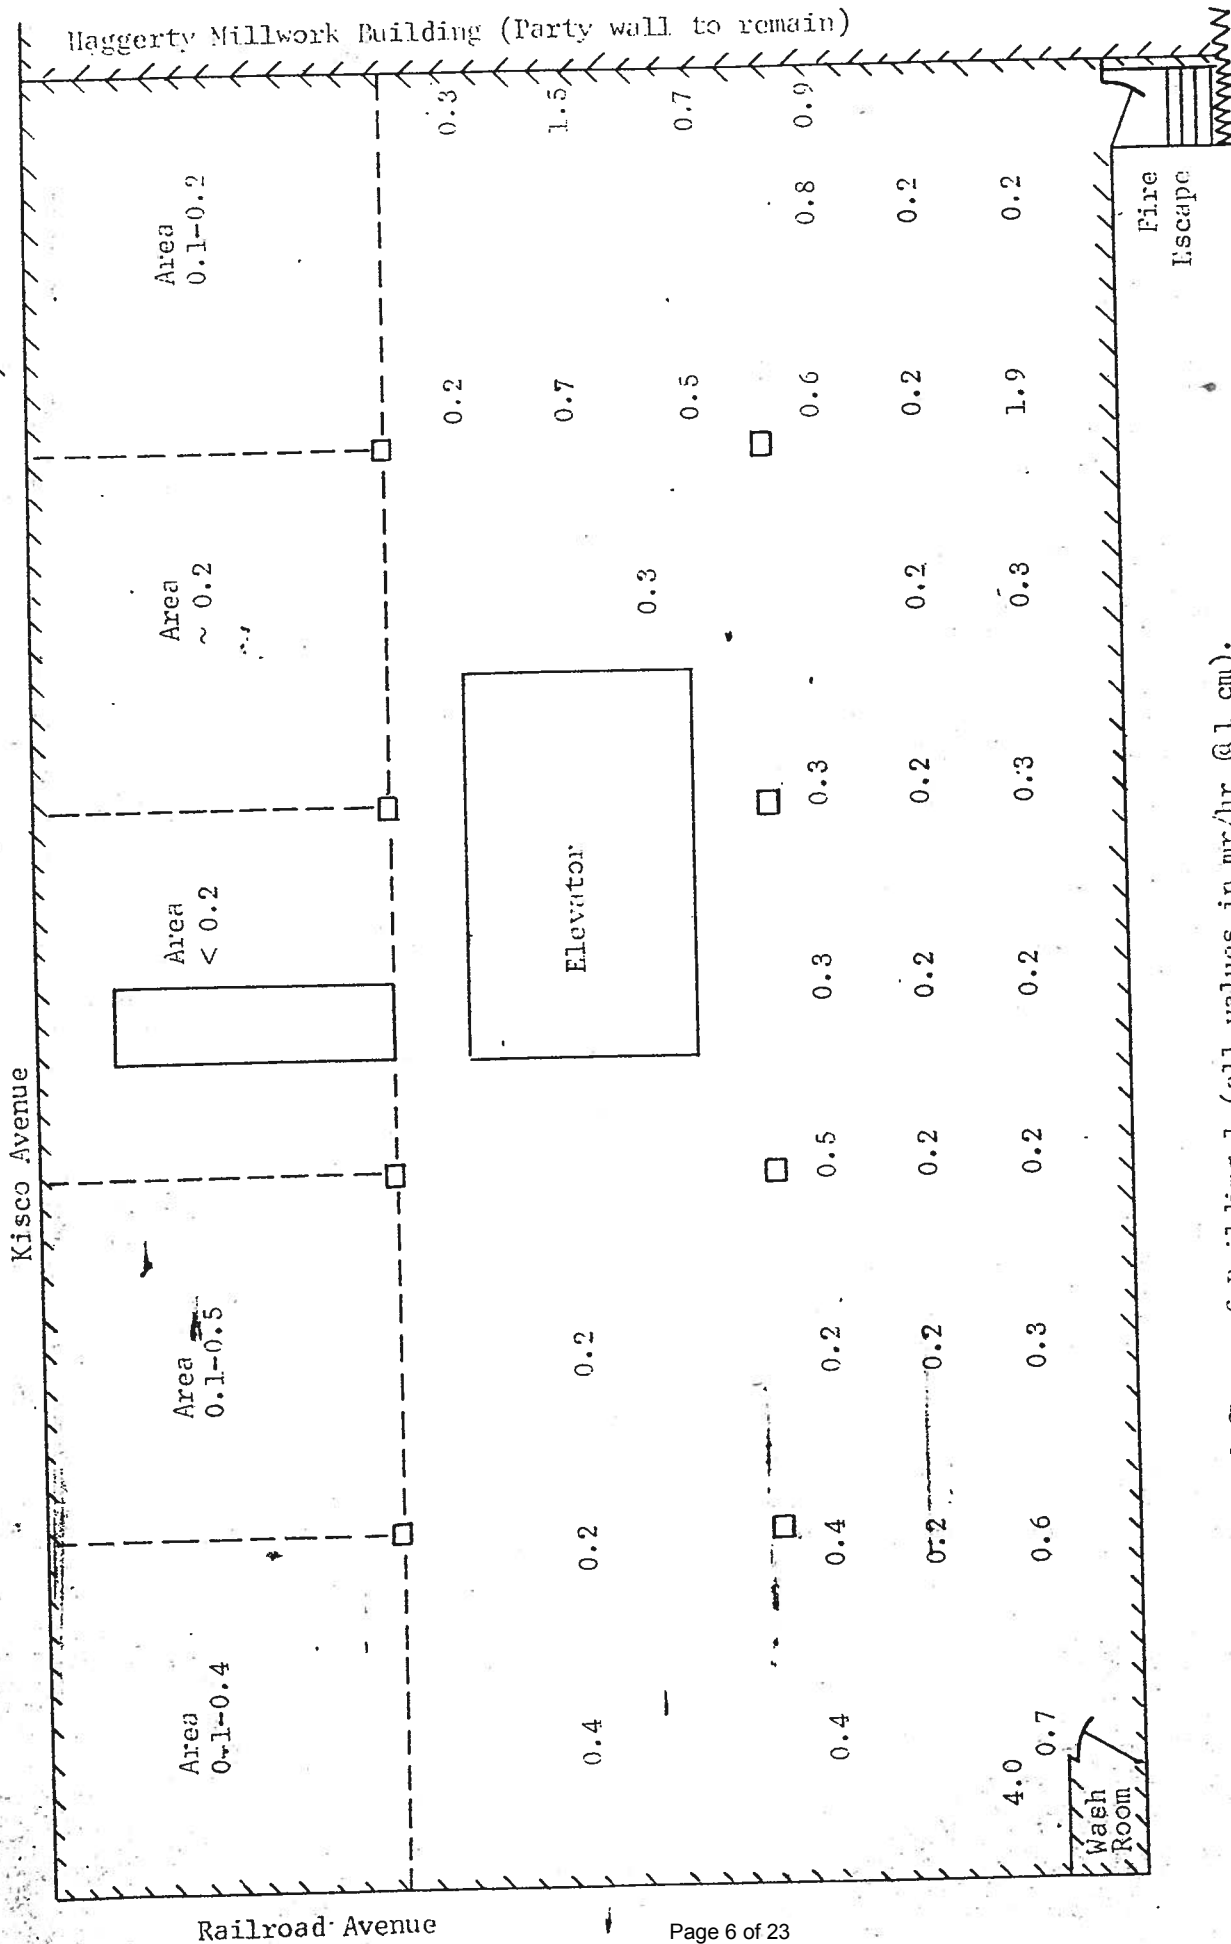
Survey of second floor of Building 1 (all values in mr/hr @ 1 cm).
